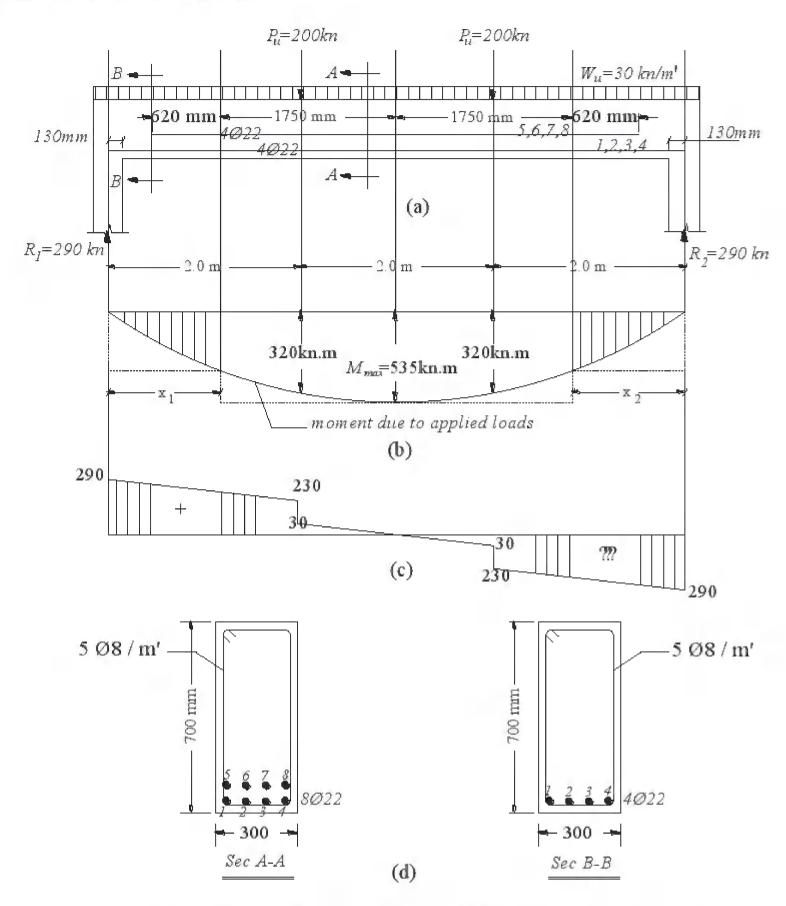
(a) Beam and loads; (b) location of theoretical cutoff points; (c) shearing force diagram; (d) cross sections
